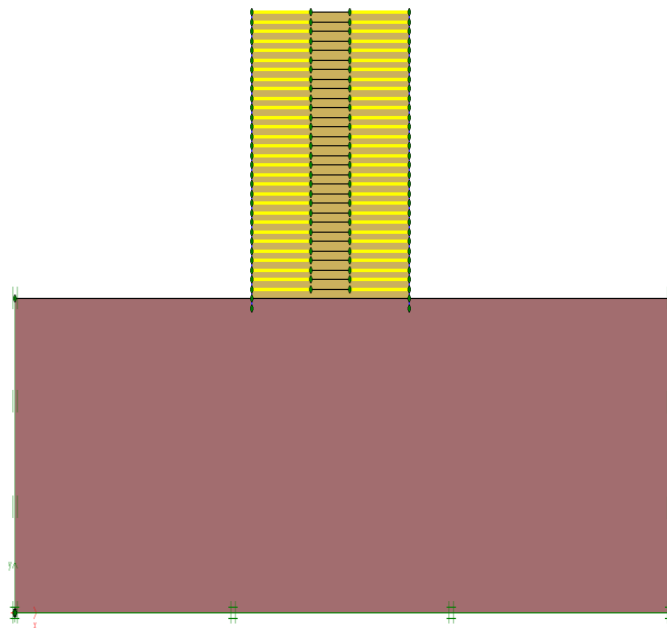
PLAXIS Model of Reinforced Retaining Wall (9m high)
